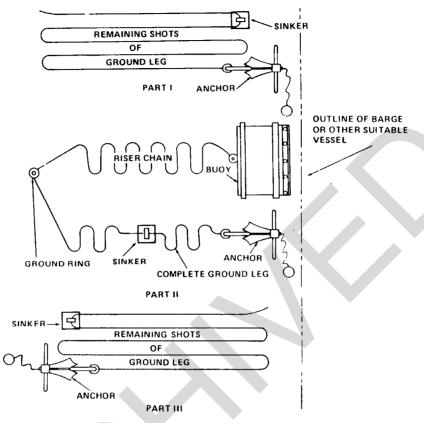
Typical Riser-Type Mooring Material Pre-Installation Layout
